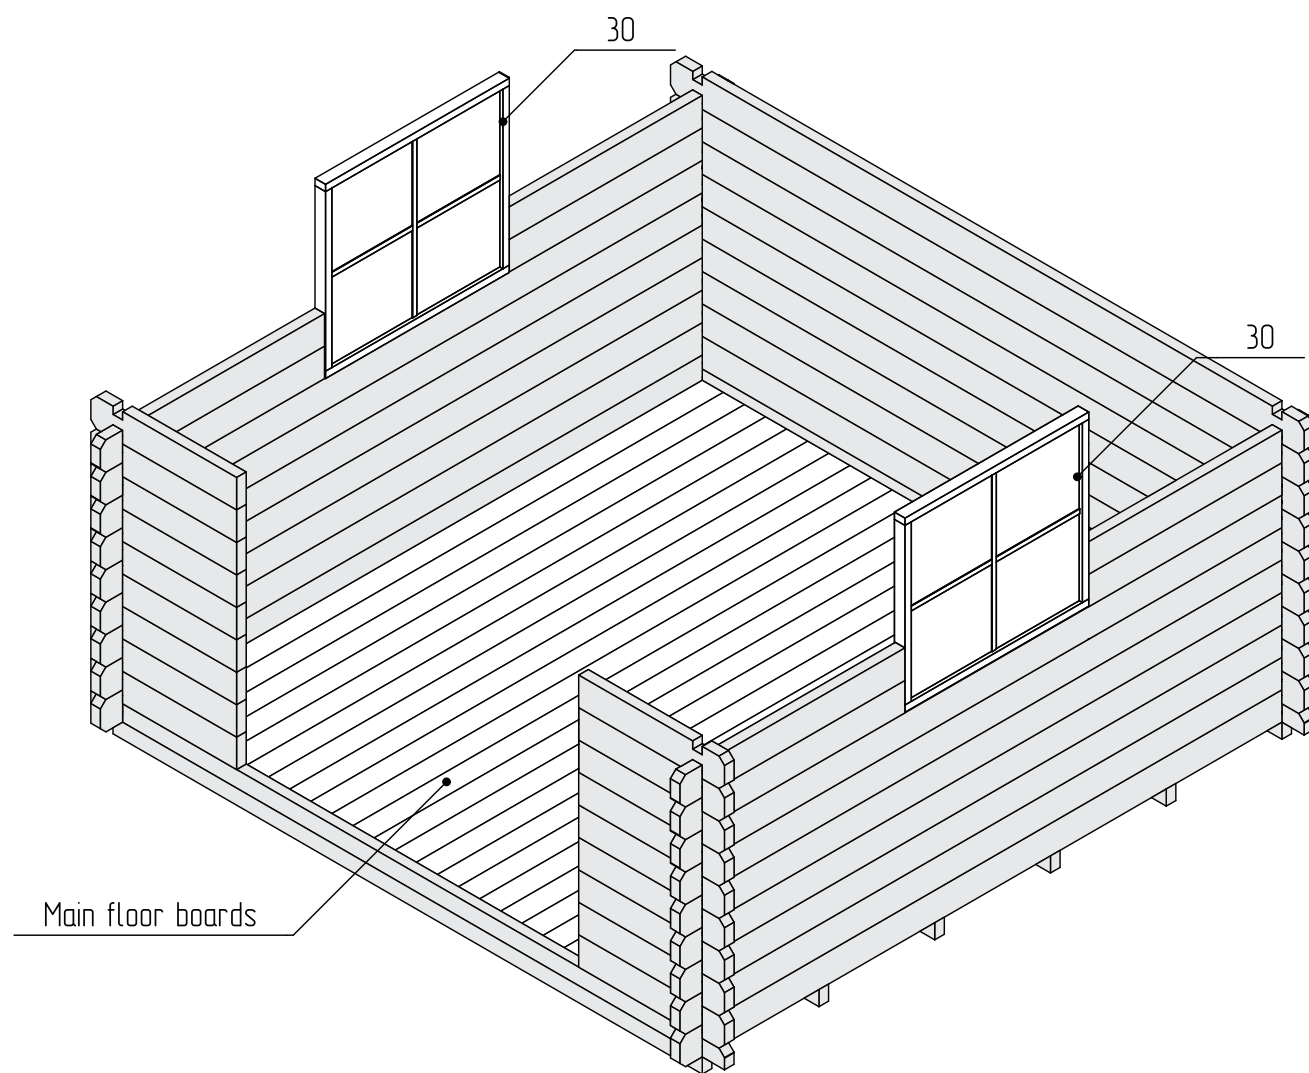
Interior floor boards: Screw on the main floor boards to the starting strips (part#23) using 2" long number 6 screws or a nail gun. Insert side windows (part #30) into the allocated openings. (required number of screws 6'x2' - 360 pcs)
